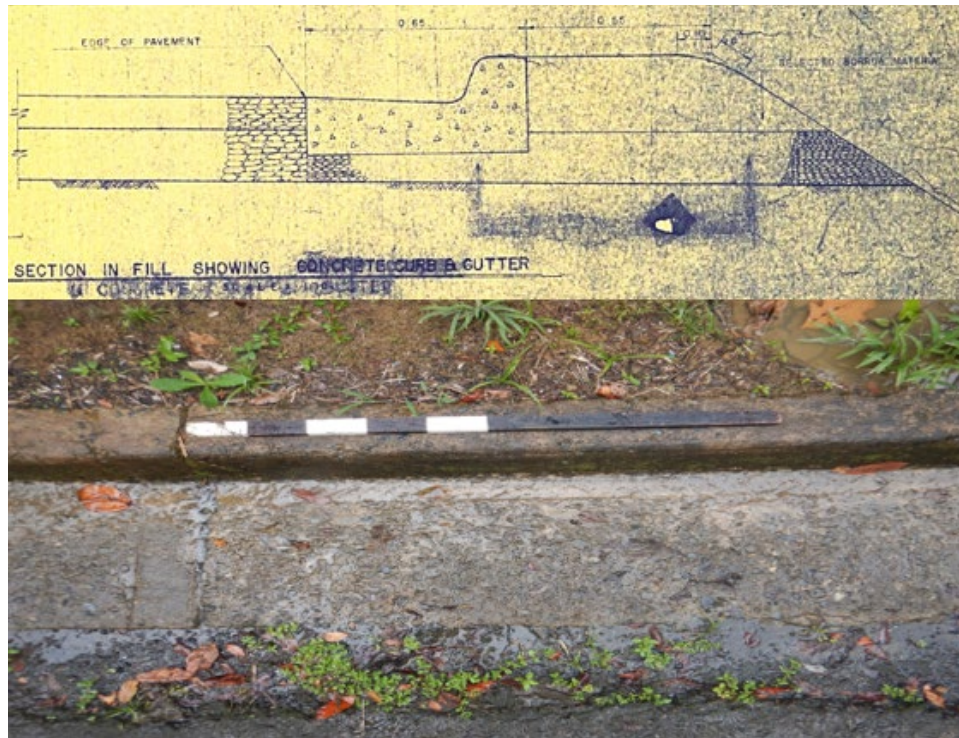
Curbs & gutters details on 1966 plans; curbs & gutters section in PR9966.
